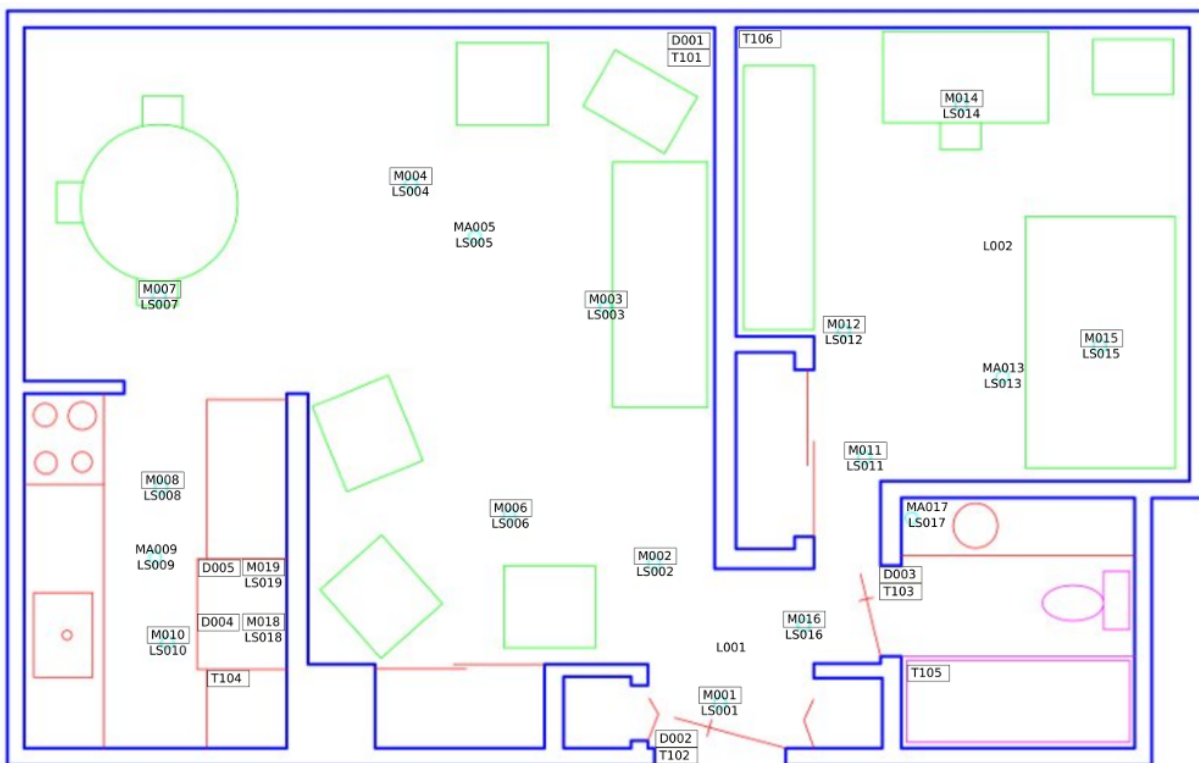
Floor plan and sensor placement for the testbed hh109.
